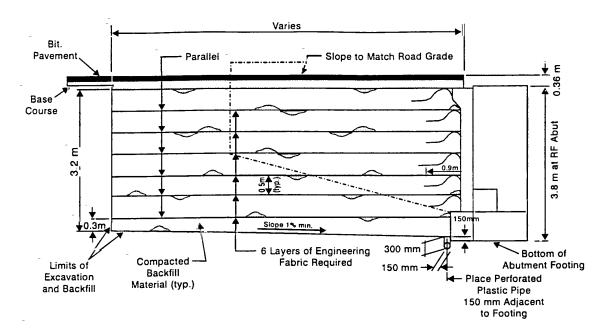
Wyoming DOT Geo-Fabric Reinforced Soil Walls, Briaud, et al., (1997).
